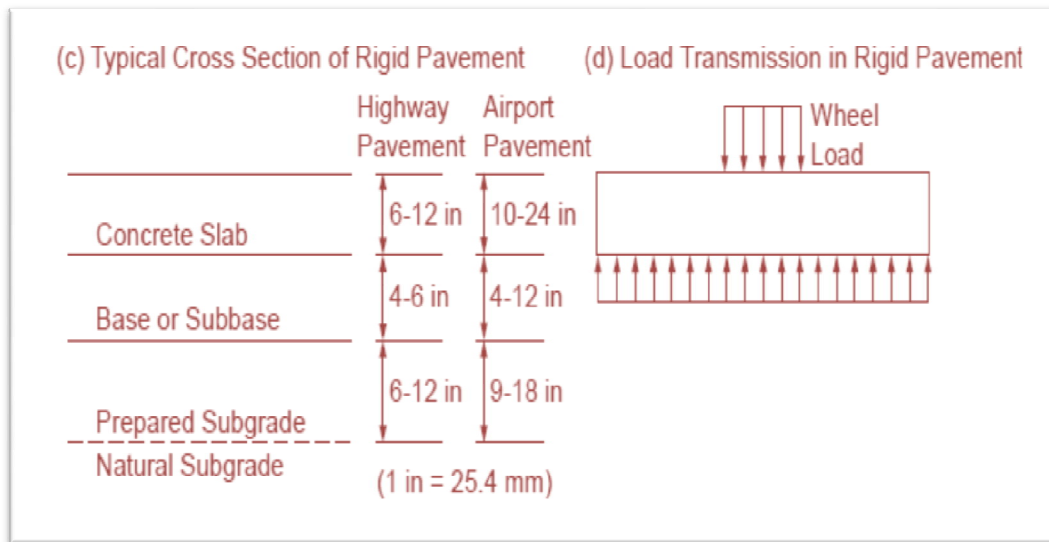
Rigid Pavement rigidity and Typical Thickness
